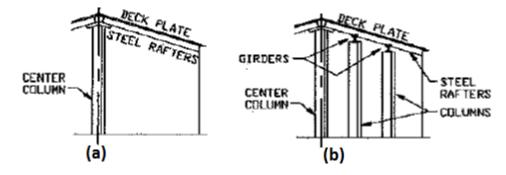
(a) Center supported cone roof, and, (b) supported cone roof.
